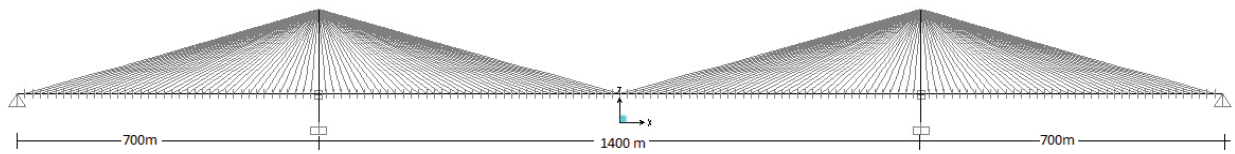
Cable stayed bridge with main span of 1400m and side span of 700m
